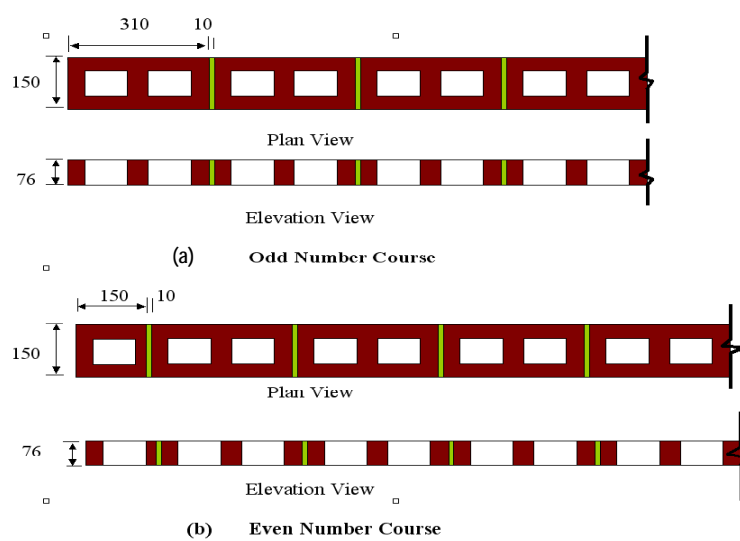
Alternate layers of hollow masonry units in the construction of masonry walls
